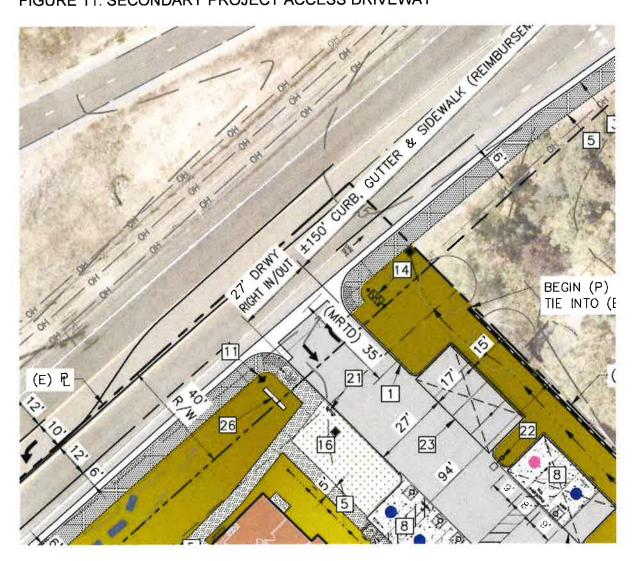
SECONDARY PROJECT ACCESS DRIVEWAY
